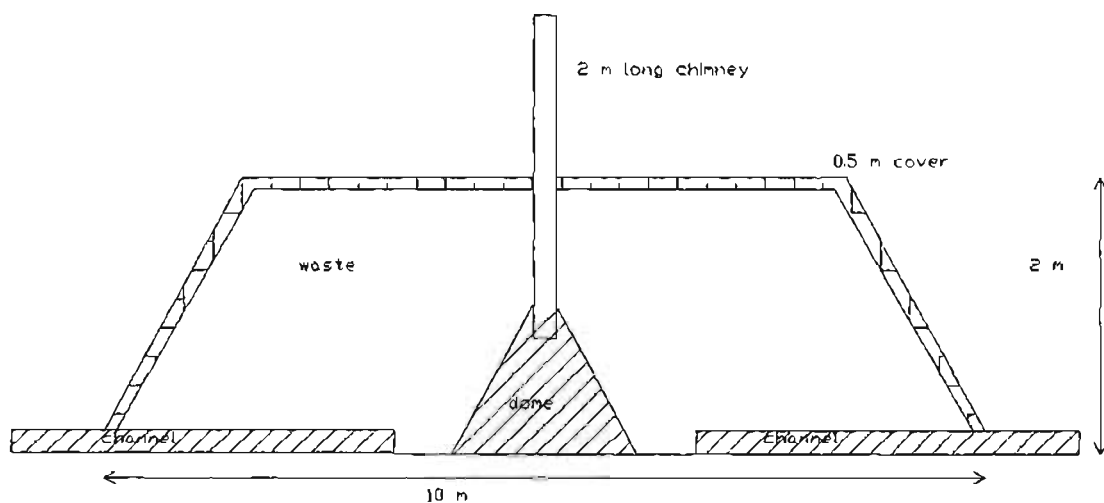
Cross sectional view of typical windrow (Simelane, 2006)
